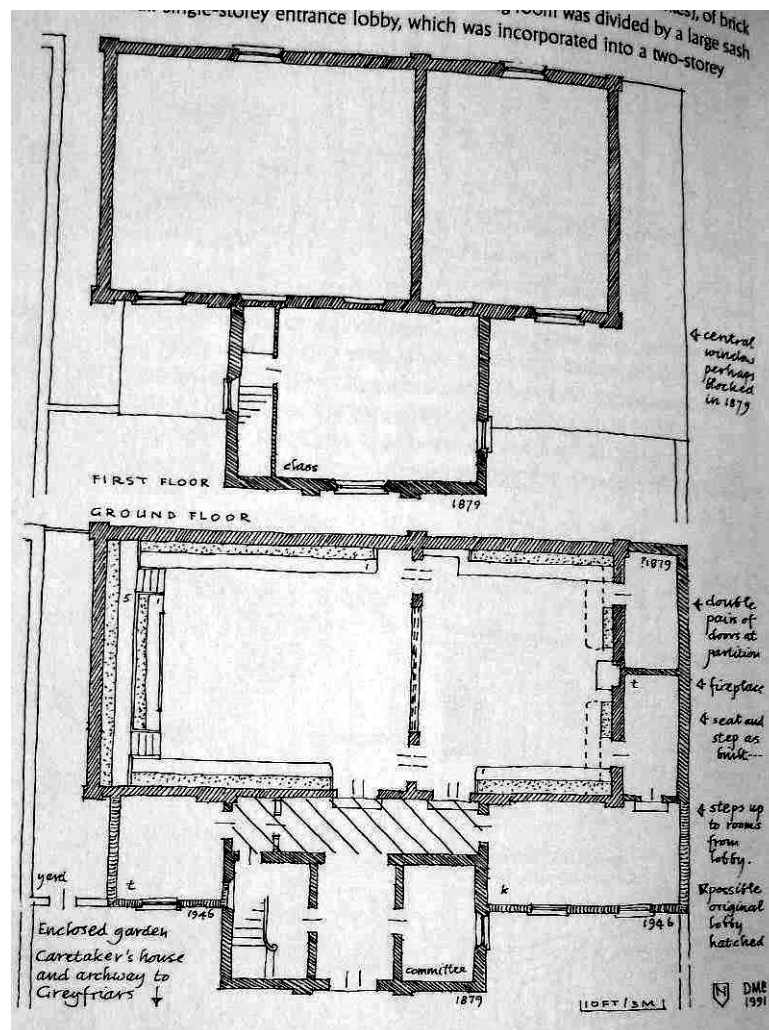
Ground and first floor plan, from Butler, vol. 1, p. 218
